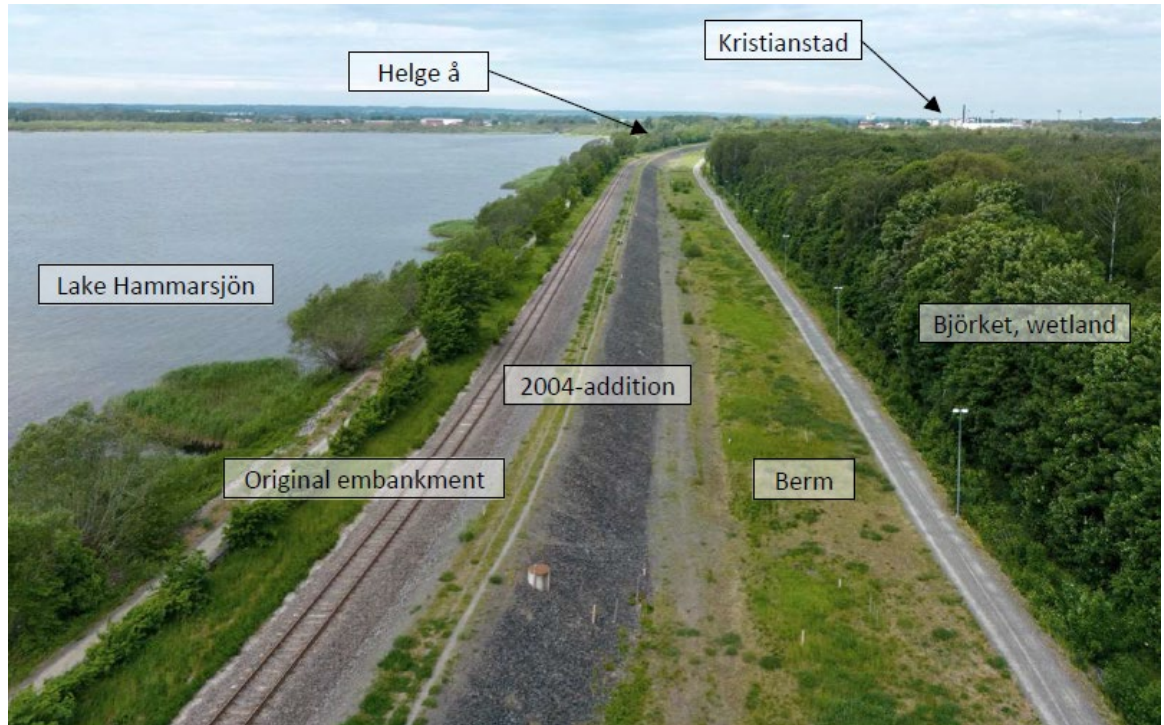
Overview of the embankment dam, its main components, and surroundings. The foundation works for the planned new structure will primarily be executed on the existing berm.
